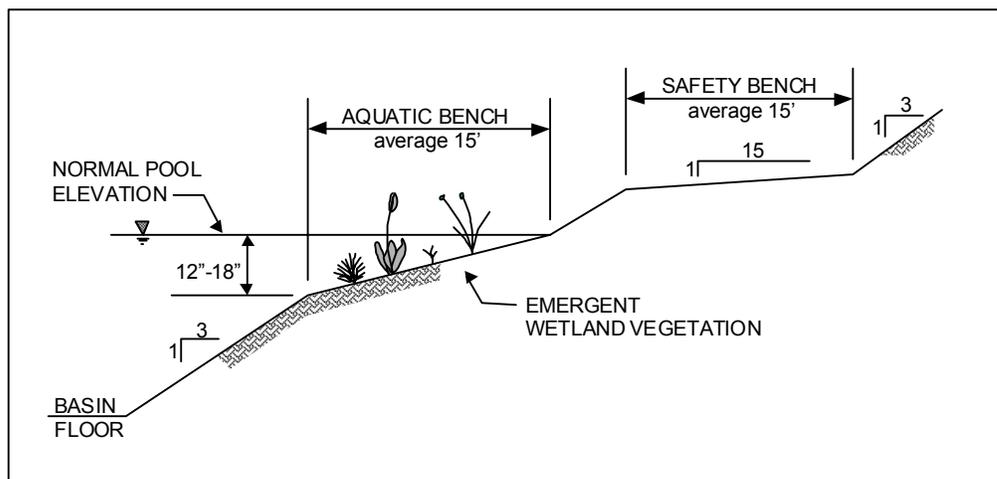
Typical Stormwater Pond Geometry Criteria
